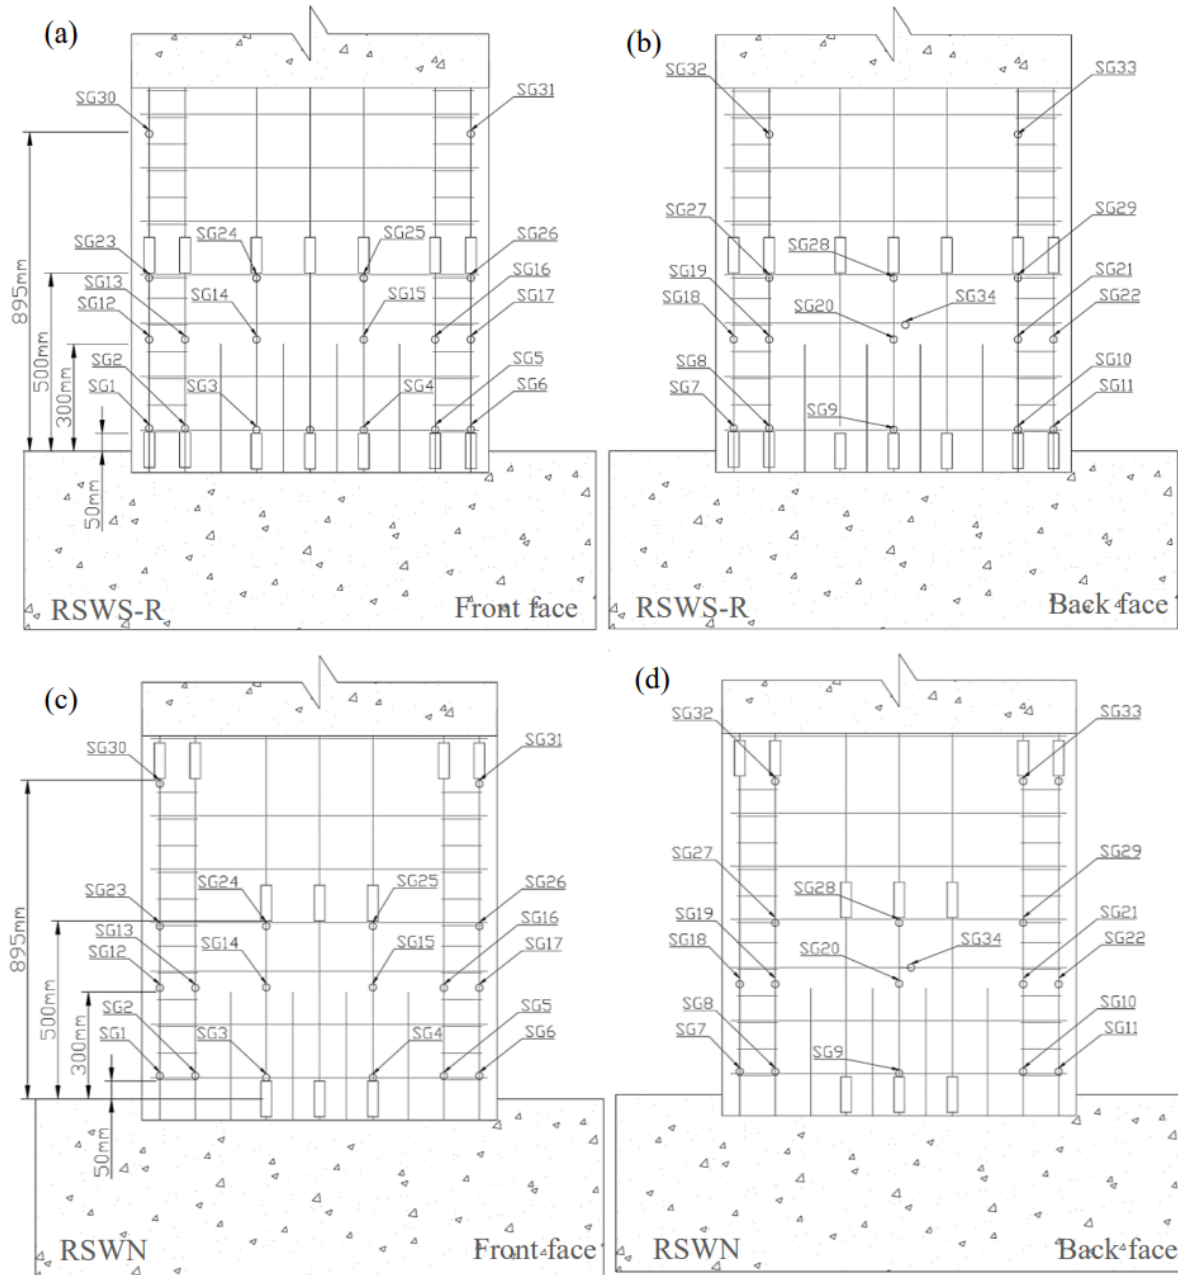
Strain gauge locations: (a) Wall RSWS-R (front); (b) Wall RSWS-R (back); (c) Wall RSWN (front); and (d) Wall RSWN (back) (M. A. Soto-Rojas, 2020).
